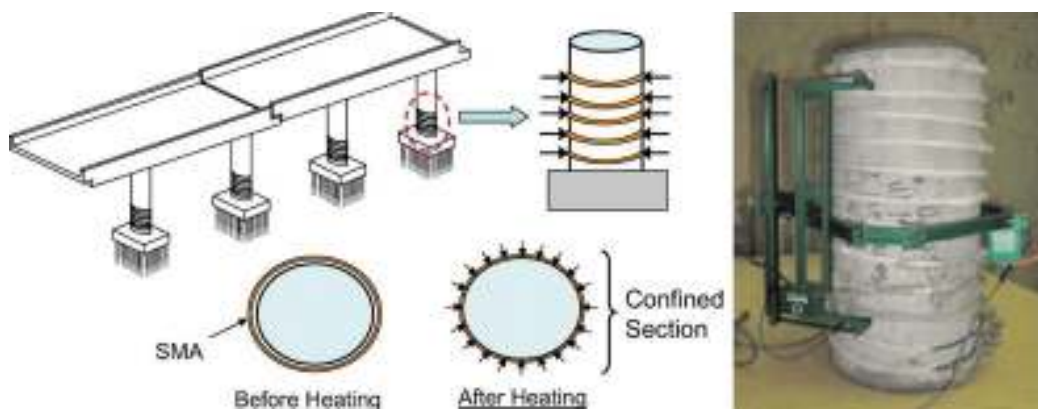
Schematic illustration of active confinement of concrete bridge piers using shape memory alloys (Andrawes et al., 2010)
